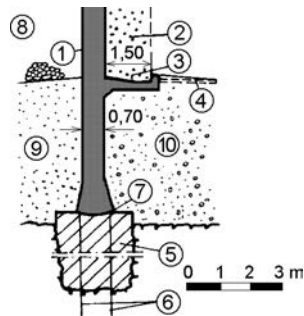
Joint of the asphaltic concrete core with the foundation of Dhünn dam. (1) Asphaltic concrete core; (2) transition zone; (3) collector; (4) drainage pipe; (5) concrete foundation (plinth); (6) grout curtain; (7) asphalt mastic; (8) rockfill; (9) compacted (dense) clay; (10) river gravel.
